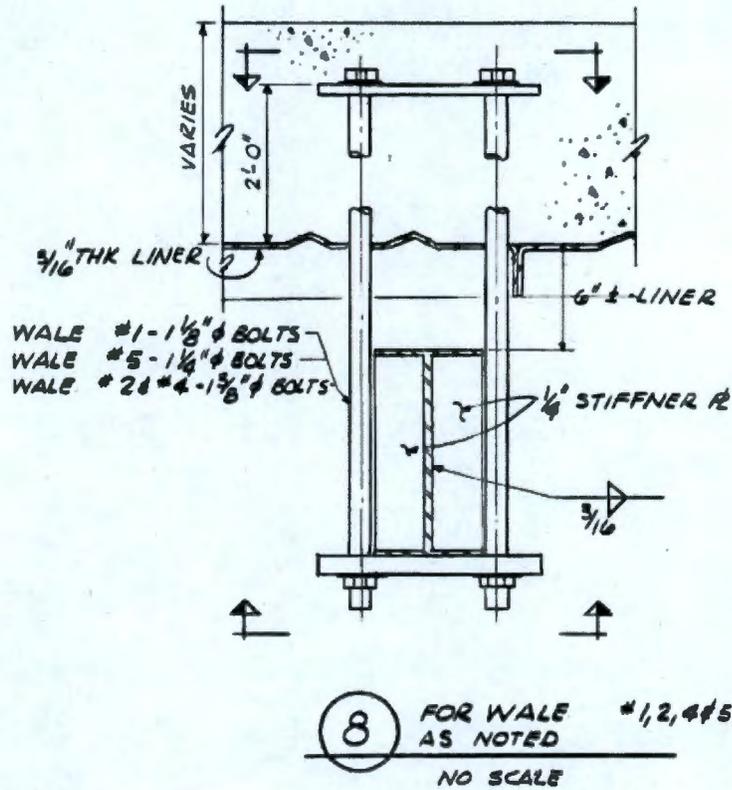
, 2, 4, & 5 to Concrete Arch Connection
